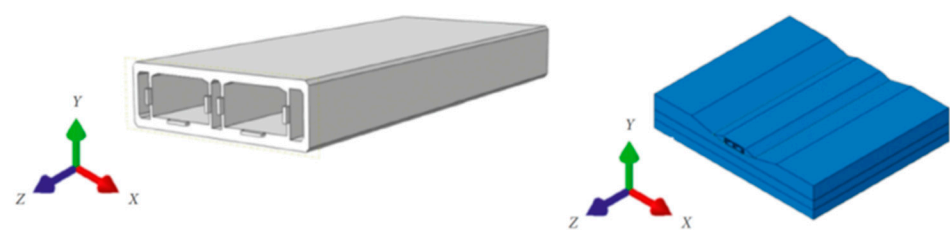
Immersed tunnel element and soil-tunnel numerical models [19].
